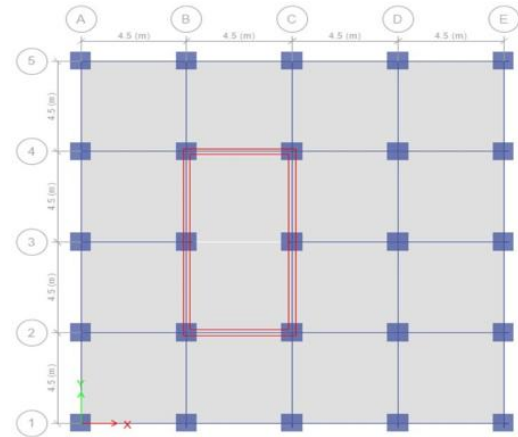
Typical floor plan showing layout of shear walls (300 mm thickness throughout building height)
